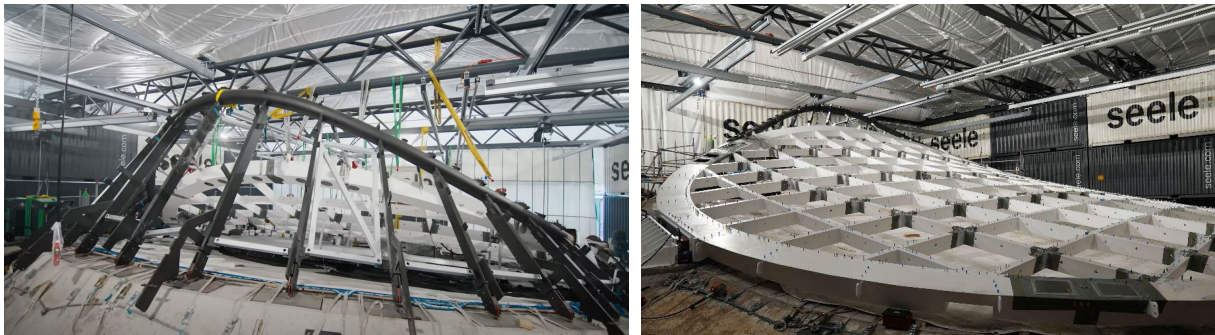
Ridge beam and its supporting columns - steel grid with its ring beam ©Werner Sobek AG.
